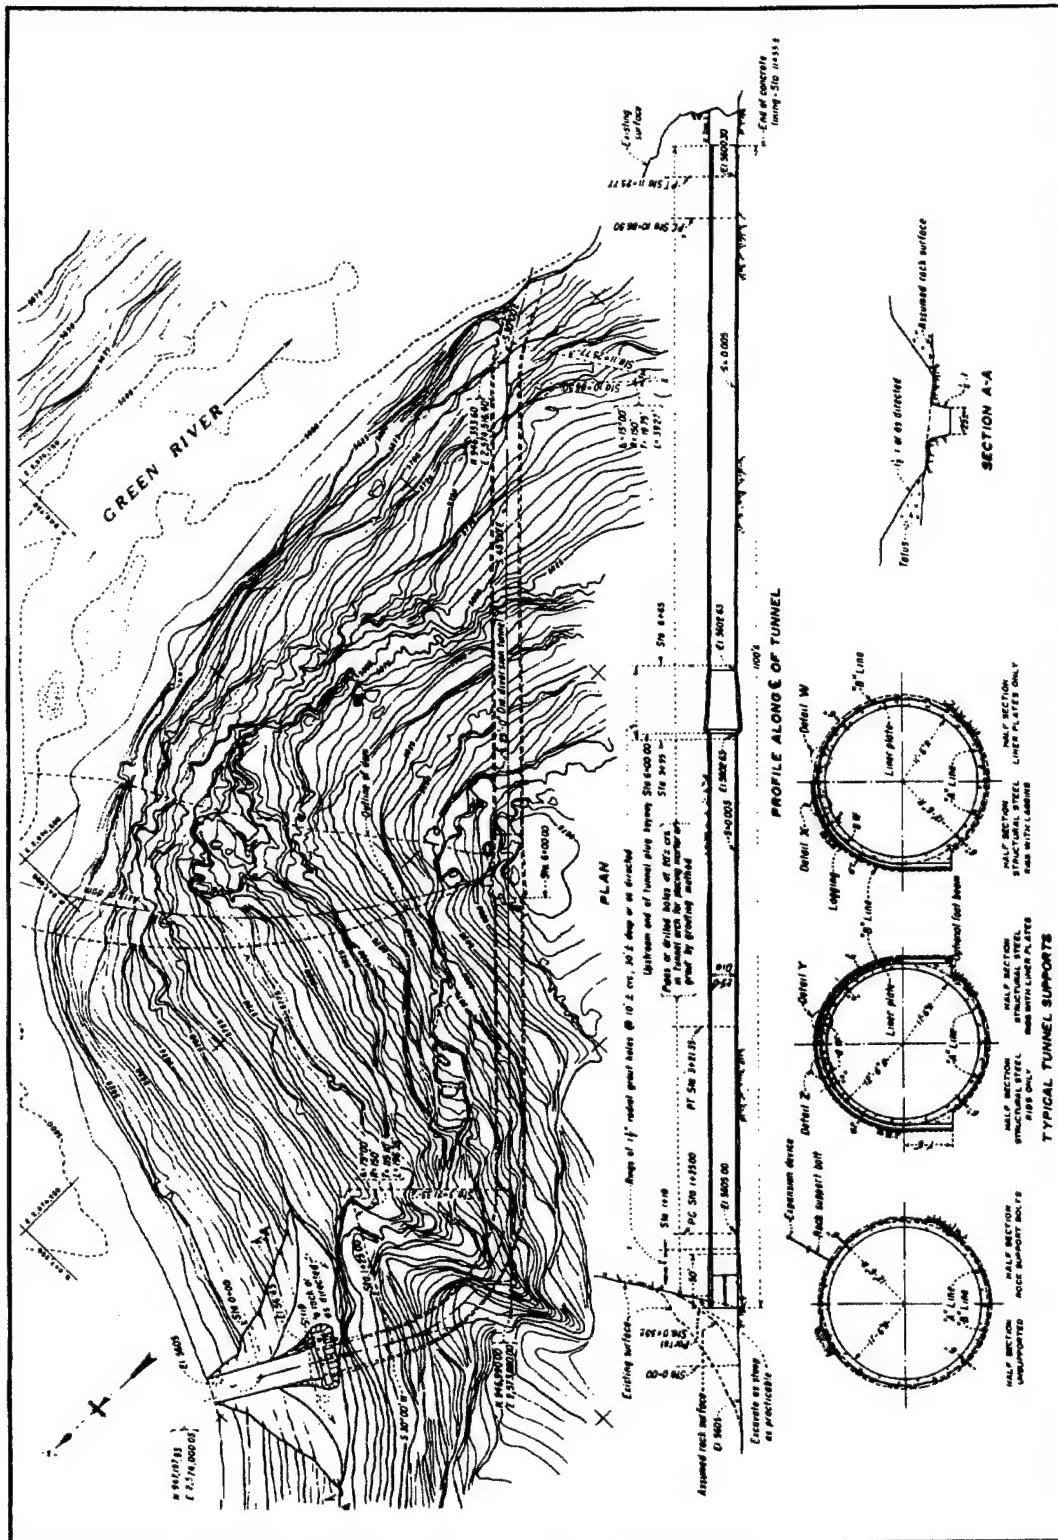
Diversion tunnel for Flaming Gorge Dam (USBR)
